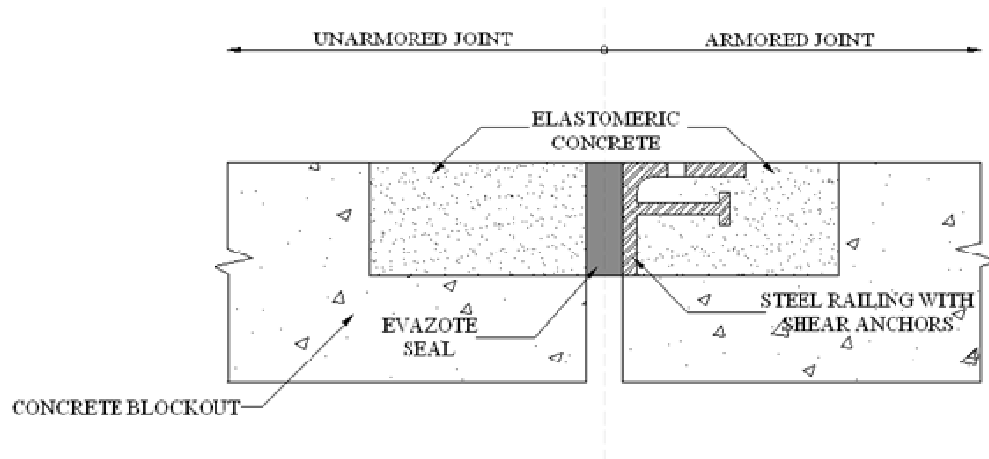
Half plan of a typical armored and unarmored expansion joints
